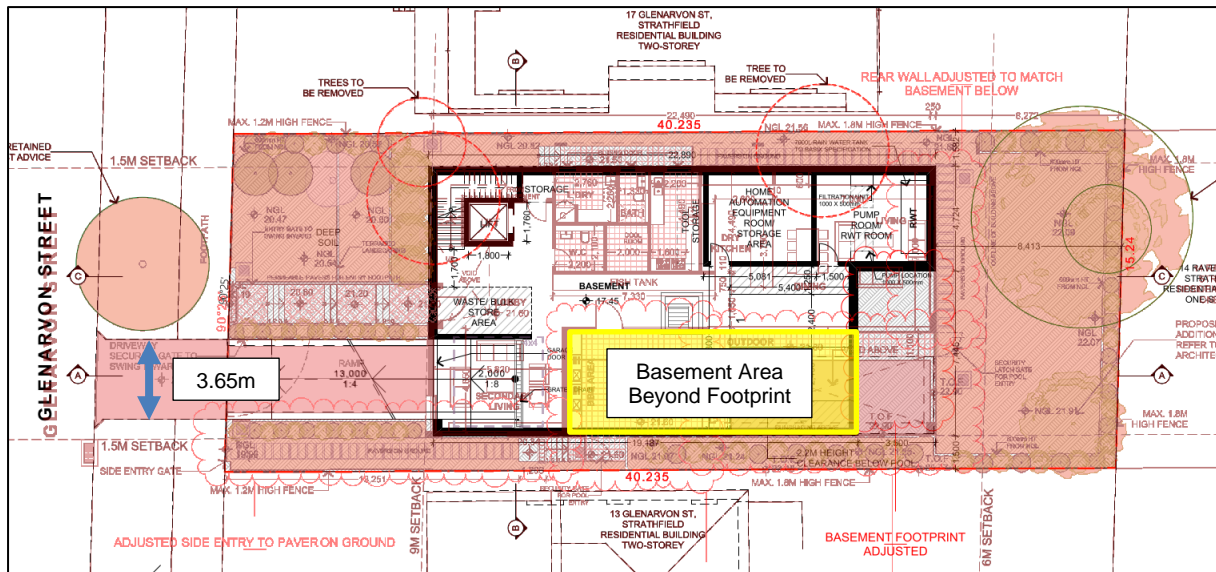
Basement and Ground Floor Plan overlay showing outline of building footprint above
